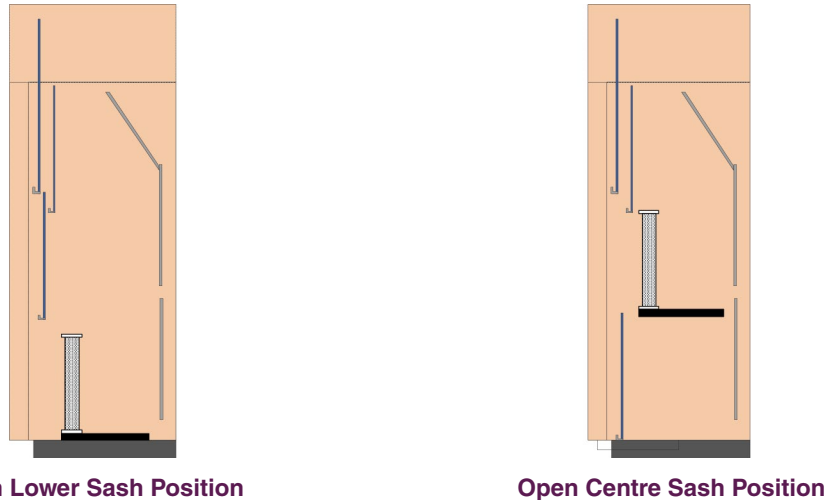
Floor-Mounted Hoods—Vertical Sash Configurations
